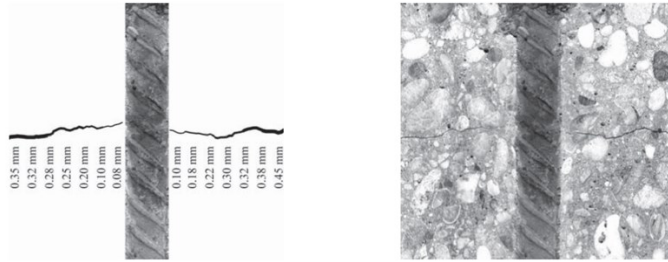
Variation of crack width for the specimen of RC tensile element with concentric steel reinforcement.
